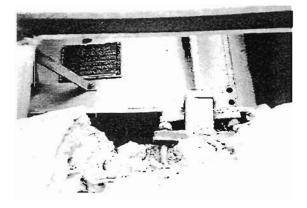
Ramp onto Hanshin Expressway near centre of Kobe: Hammering at joint has damaged deck joint and parapets
